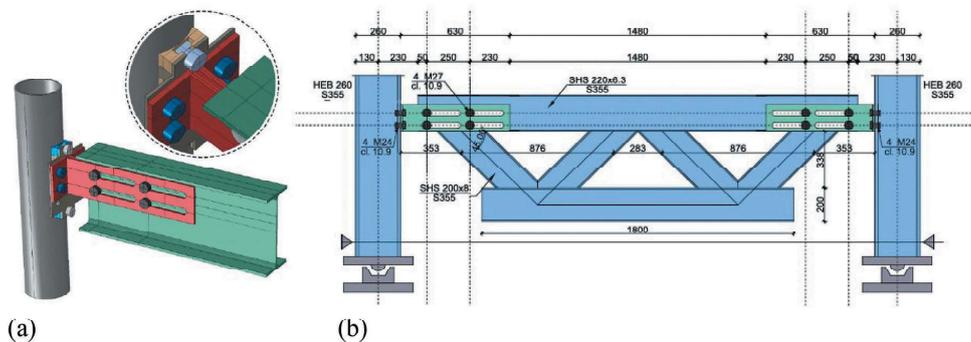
Simple joints. a) Open section to tubular columns. b) Truss girder to open section columns.
